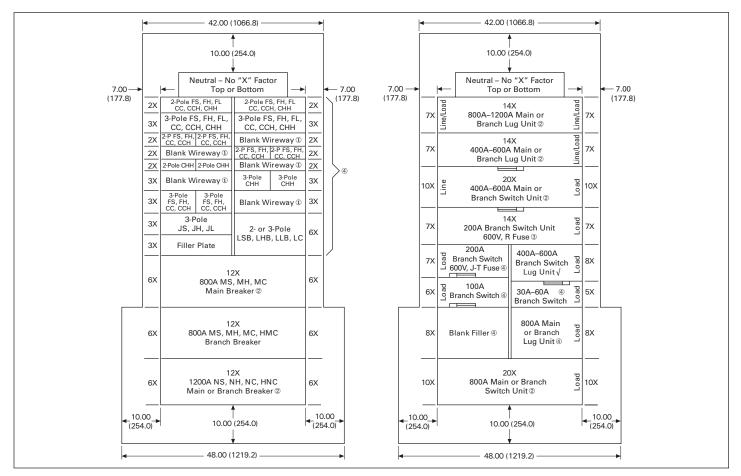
Double-Bus Interior Mounted in 42.00-Inch (1066.8 mm) or 48.00-Inch (1219.2 mm) Wide Enclosure—Dimensions in Inches (mm)
